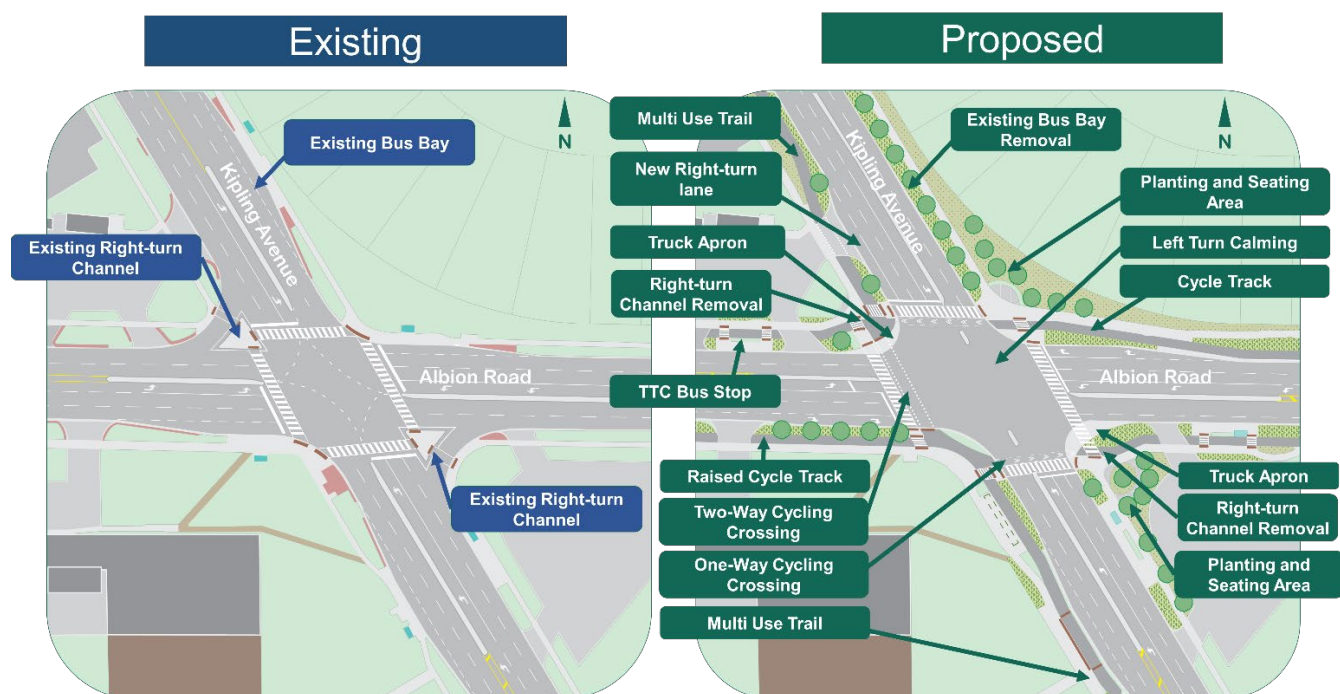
Existing and Proposed Intersection Configuration at Kipling Avenue and Albion Road
